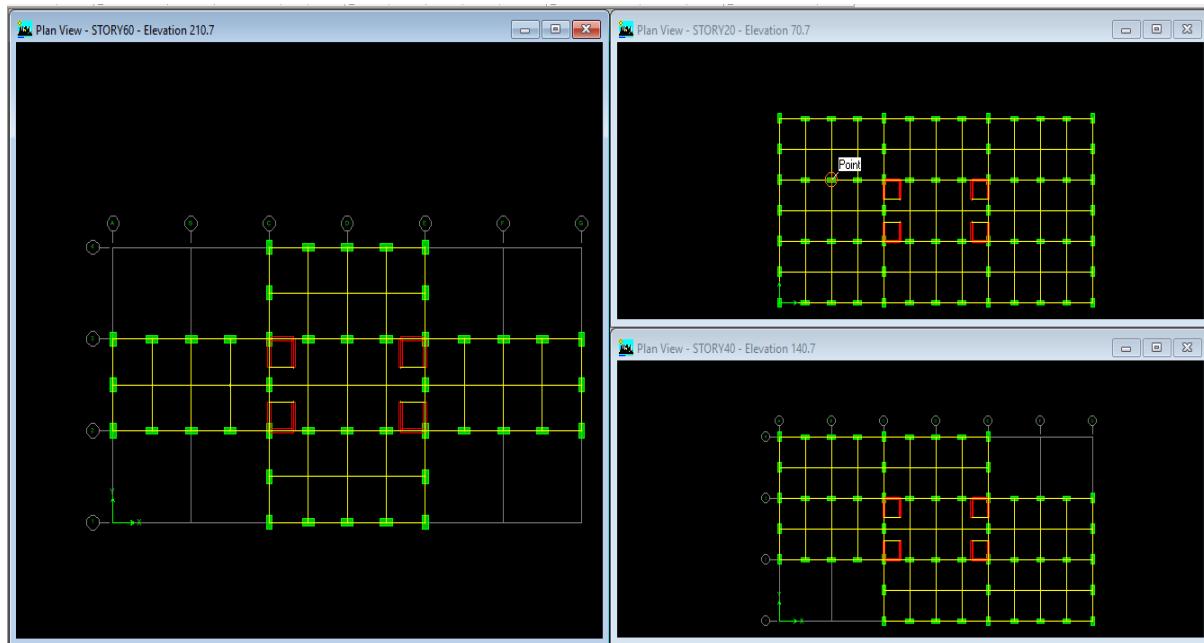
(a): Plan view of 60 storied Bundled Tube structure building
